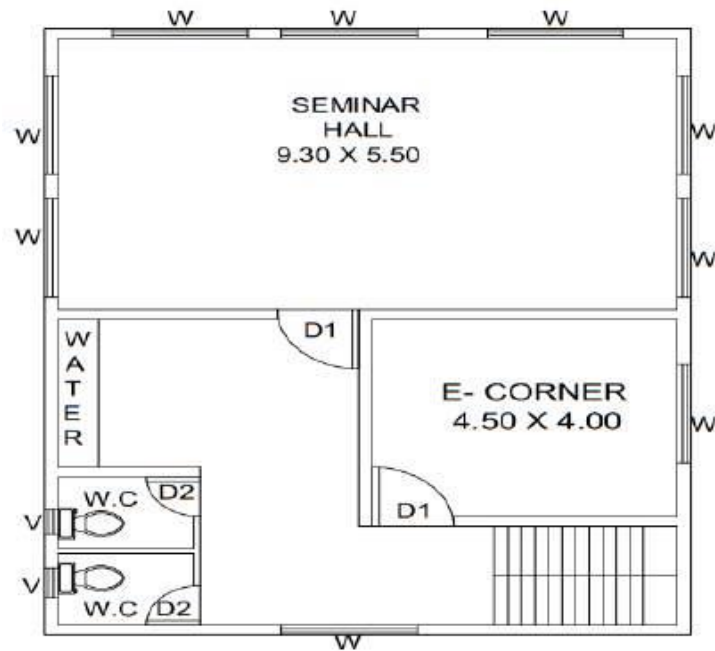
Plan of the Ground floor of Skill Development Centre
